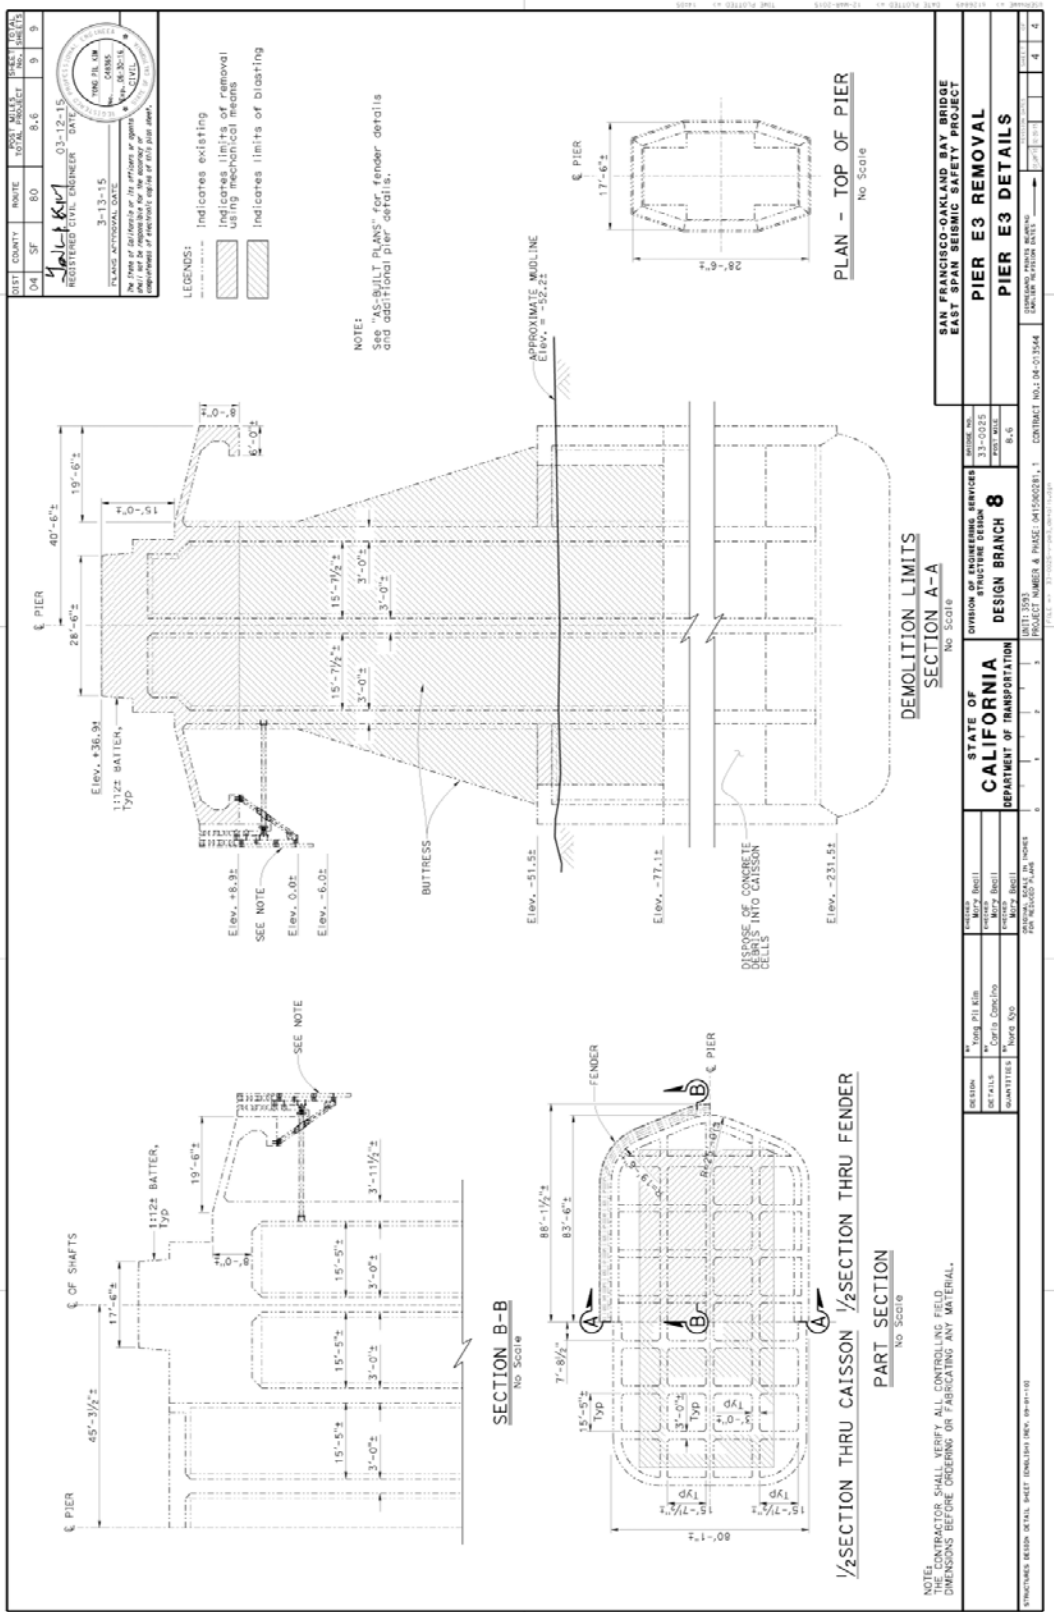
Final Plan Sheet of Pier E3 Showing Elevations, Dimensions, and Limits of Removal
